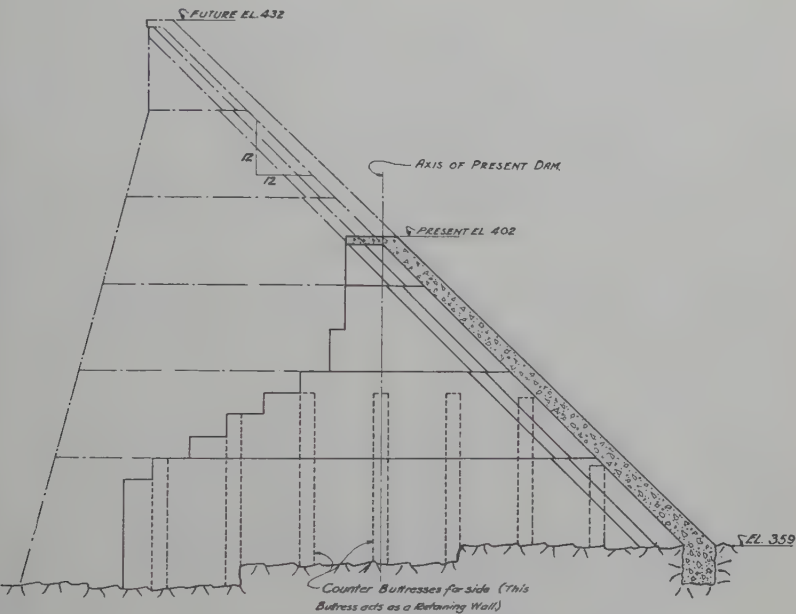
SECTION THROUGH BULKHEAD BUTTRESS
